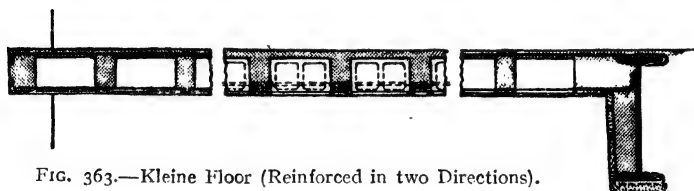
Kleine Floor (Reinforced in two Directions).
